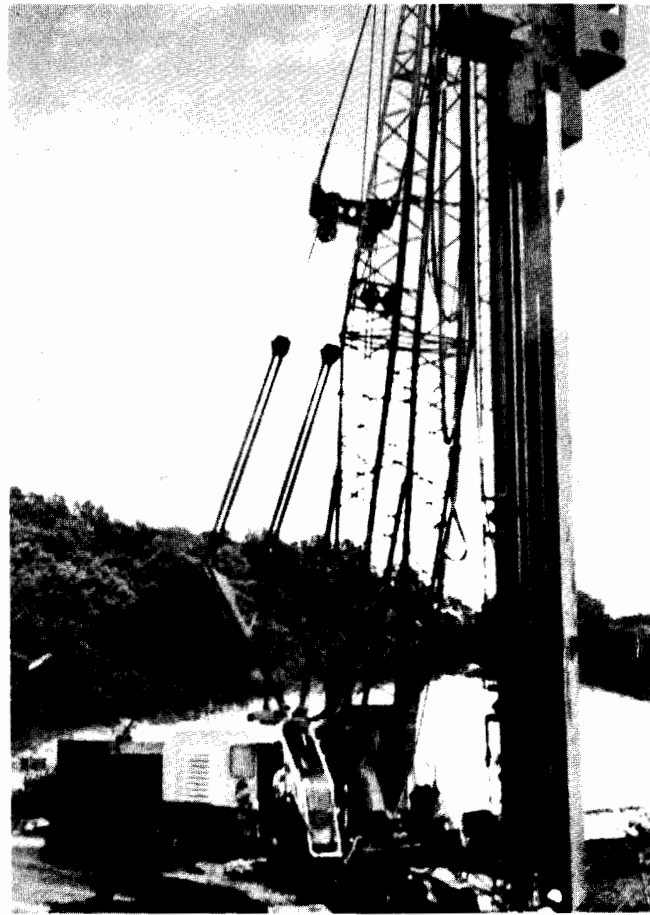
Vibrating beam technique for installation of cement-bentonite slurry wall. (Courtesy of Slurry Systems, Inc., Gary, Ind.)
